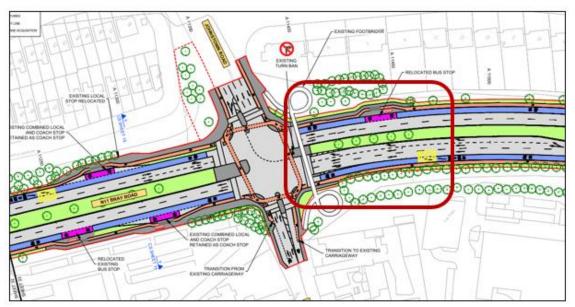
Extract from General Arrangement Drawing at N11/ Johnstown Road junction (Sheet 33)
